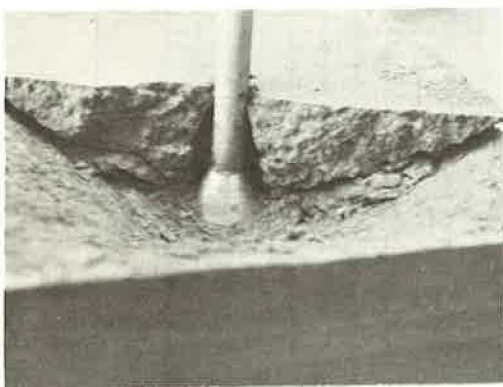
Failure plane for top bell for a 2.8-bell diameter spacing.
